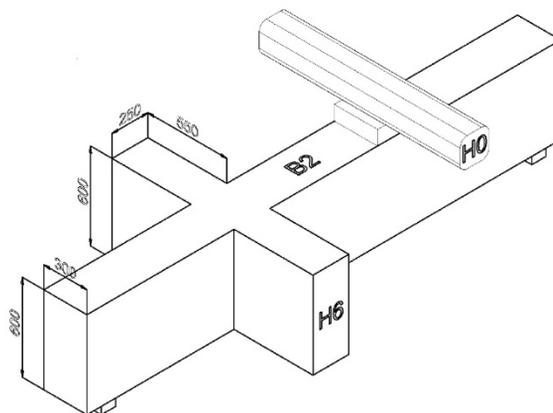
Description of specimen B2 (dimensions in mm) [1]
